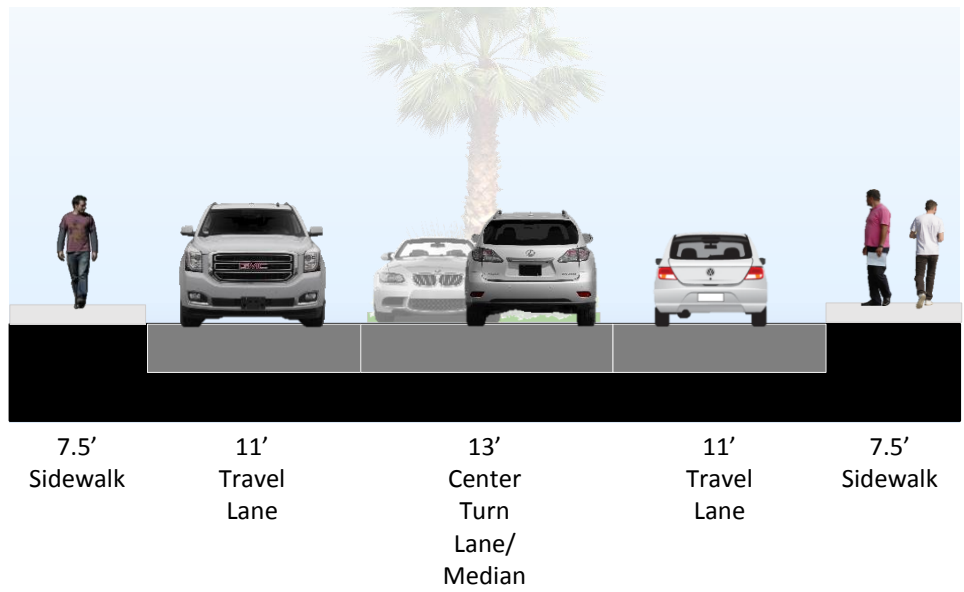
Florida Avenue Alternative 2 Typical Cross-Section
